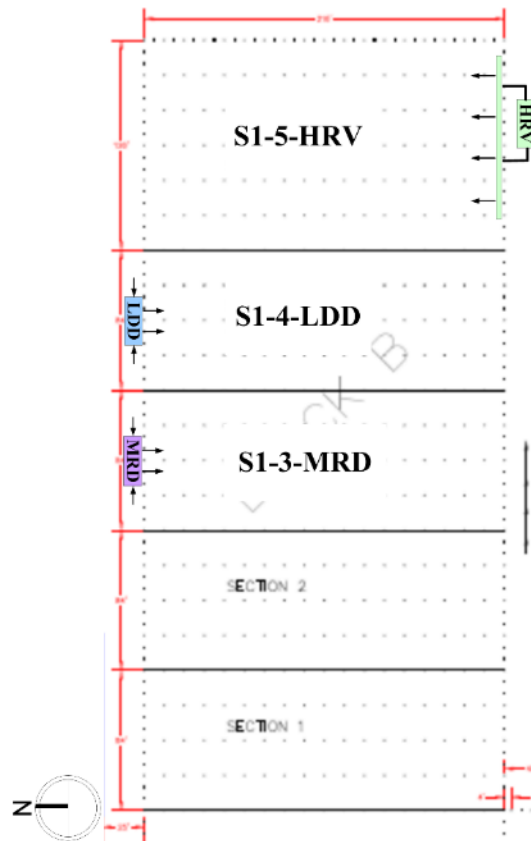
Site A plan view illustrating the location of the three dehumidification units at the flower greenhouse.
